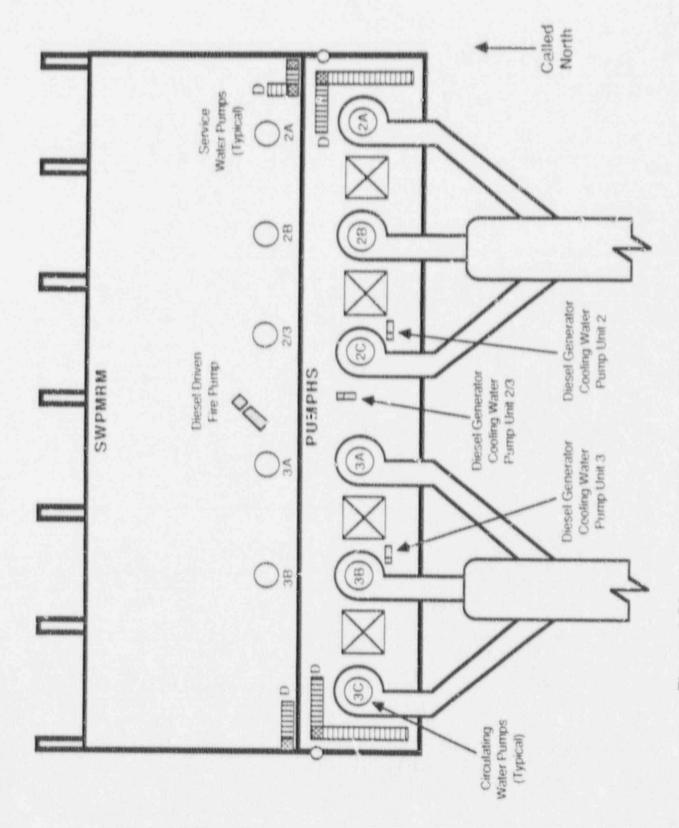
Uresden Unit 2 and 3 Crib House, Elevation 517'-6"
